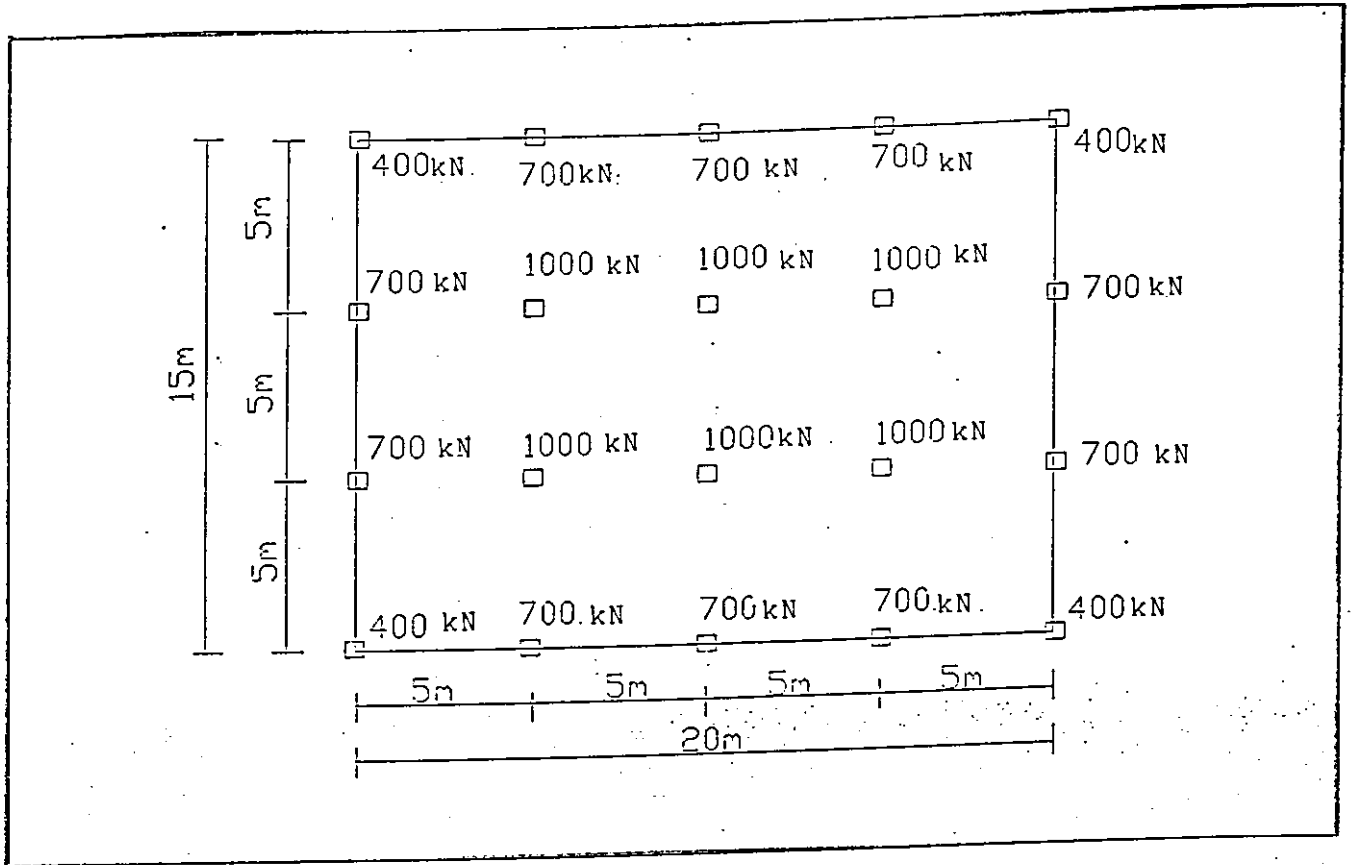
Layout of mat foundation 15m x 20m.
